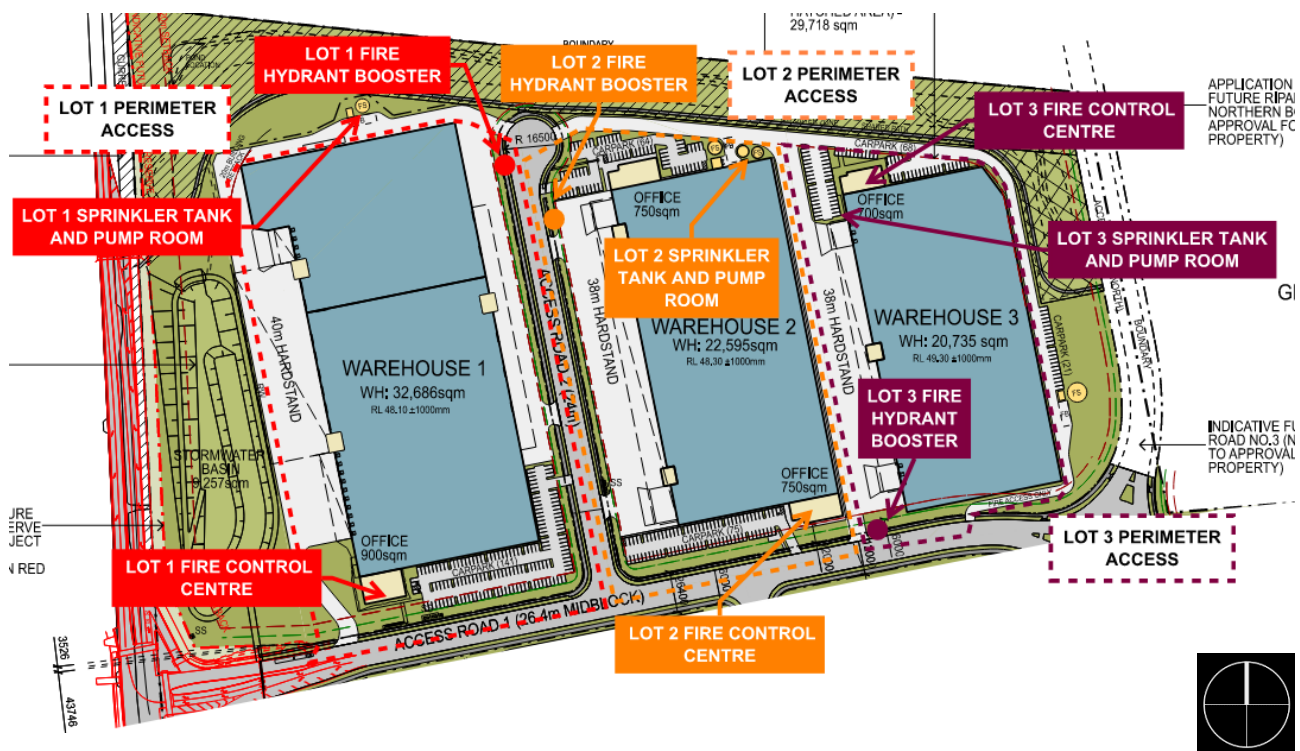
Fire Brigade Access and Site Facilities – Northern Side
